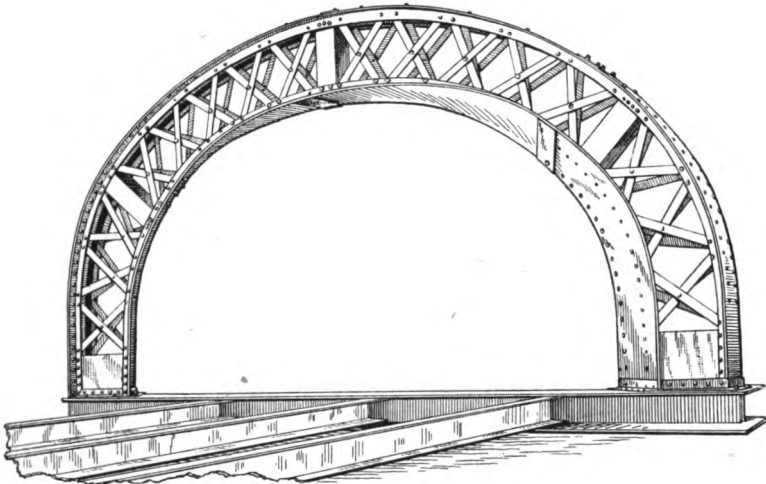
Steel Frame and Cross-struts for Underground Arch of Reinforced Concrete.
